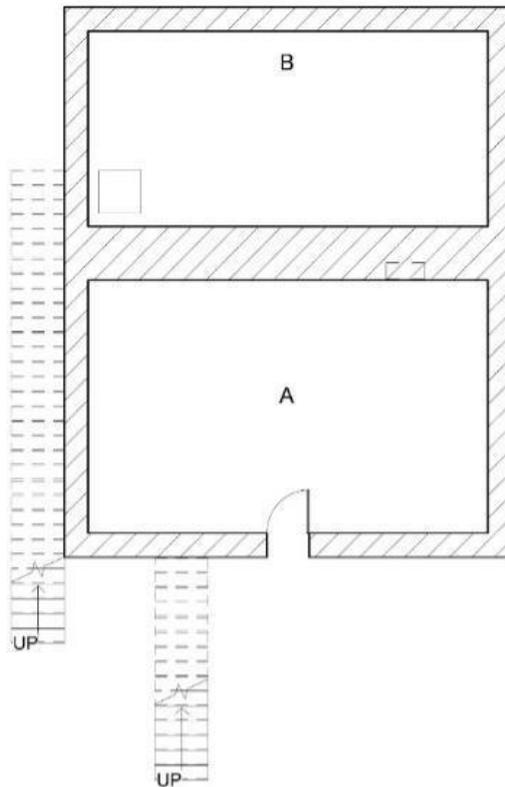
Al-Jadlan House Ground Floor Preliminary Plan (developed by the researcher)
